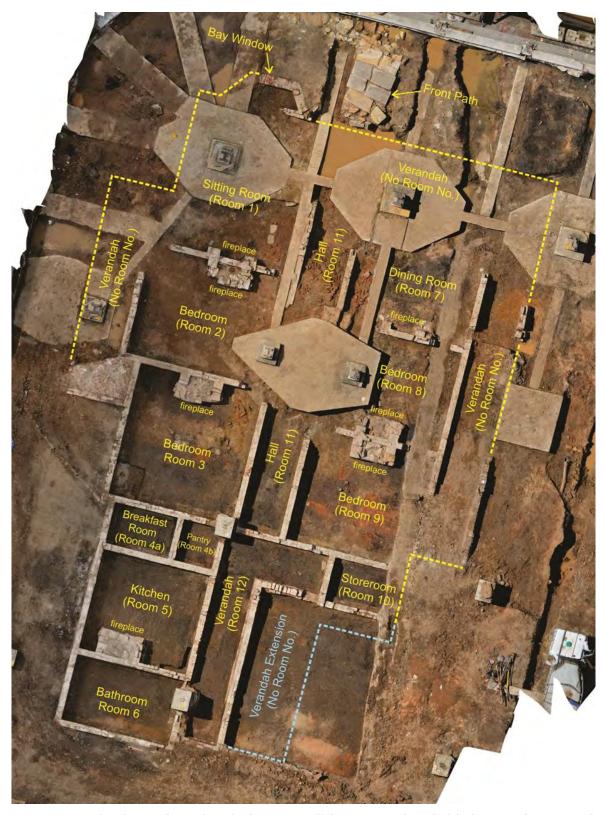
Orthophoto of Cranbrook showing wall footings and probable layout of rooms. The large outbuilding to the south containing the laundry is not shown. The yellow dotted lines indicate the outline of the building where it has been removed by the 1960s Post Office and 20th-century services and the blue dotted line corresponds with an external wall illustrated on the 1895 Parramatta Detail Series but not found during excavation. The large octagonal concrete pads are part of the Post Office foundations. North is at the top of the image. Hazell 2016 with annotations by Casey & Lowe.
